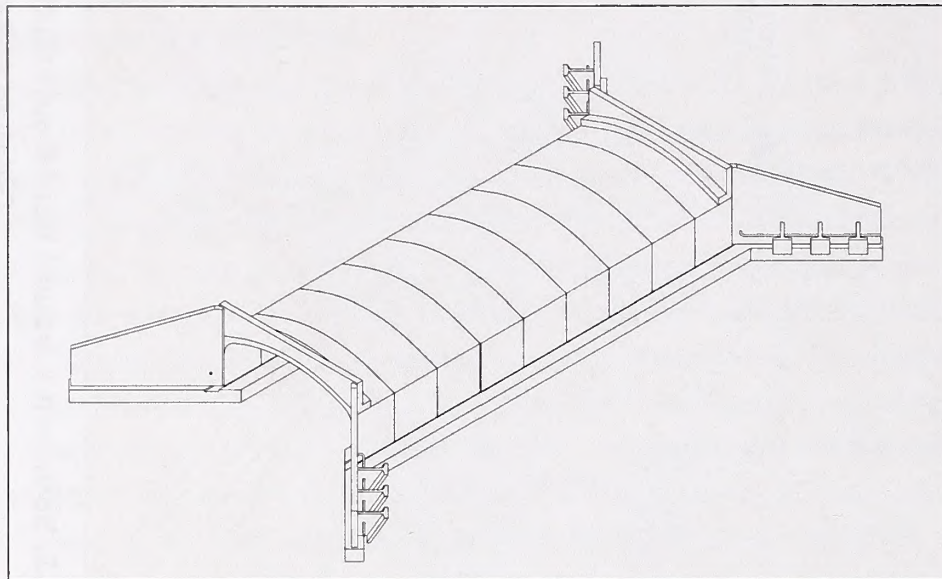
Diagram of Typical Arch Plate Culvert.
